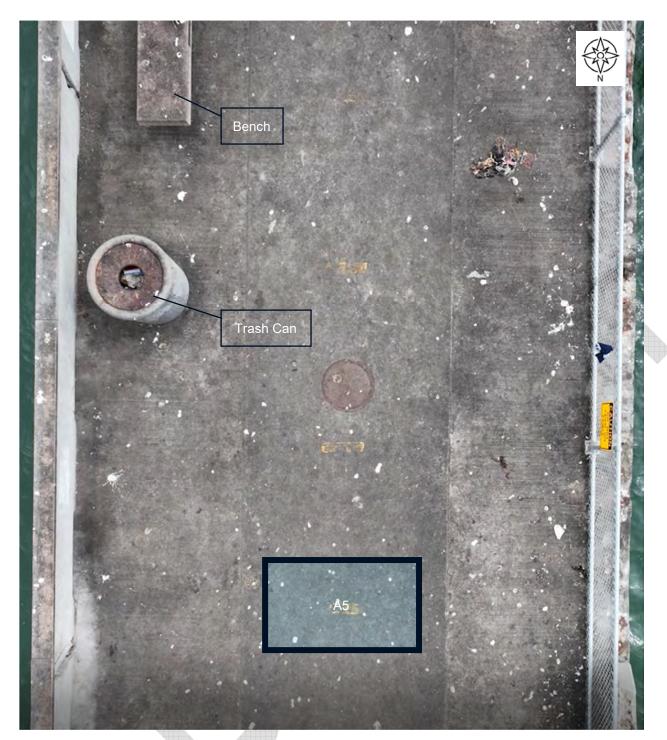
Delaminated Area between Bent 4 and Bent 3 - N-S Extension Pier
